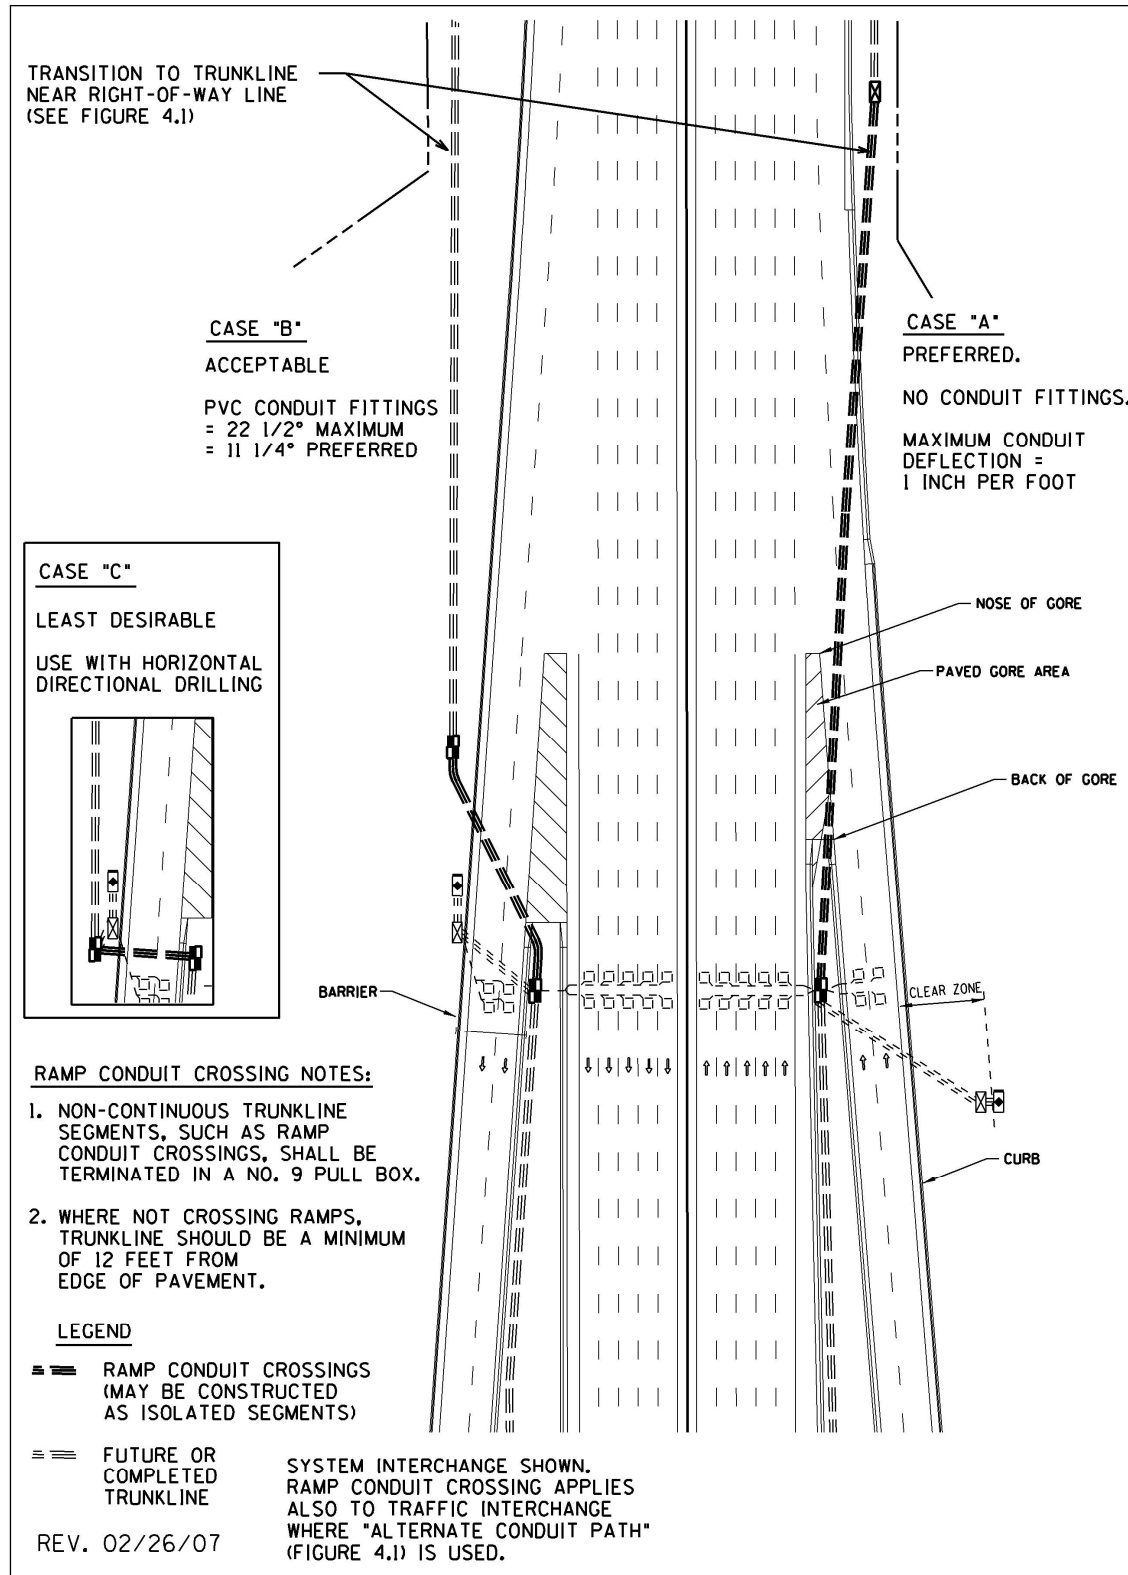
Ramp Conduit Crossings At Interchange Ramps
